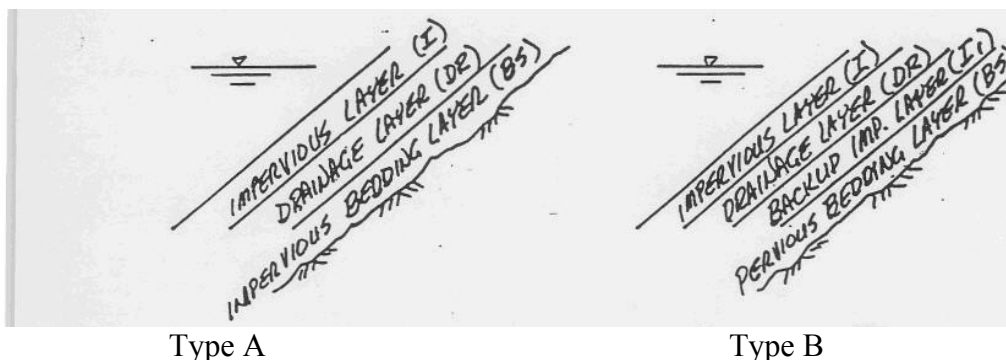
Composite Diaphragm as an Asphalt Concrete Facing
